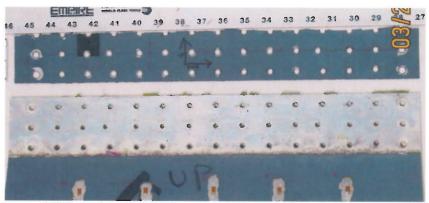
Failure of the test panel at the top most row of the fasteners (nearest the scale; scale in inches). It can be seen that the bottom panel is completely intact.
